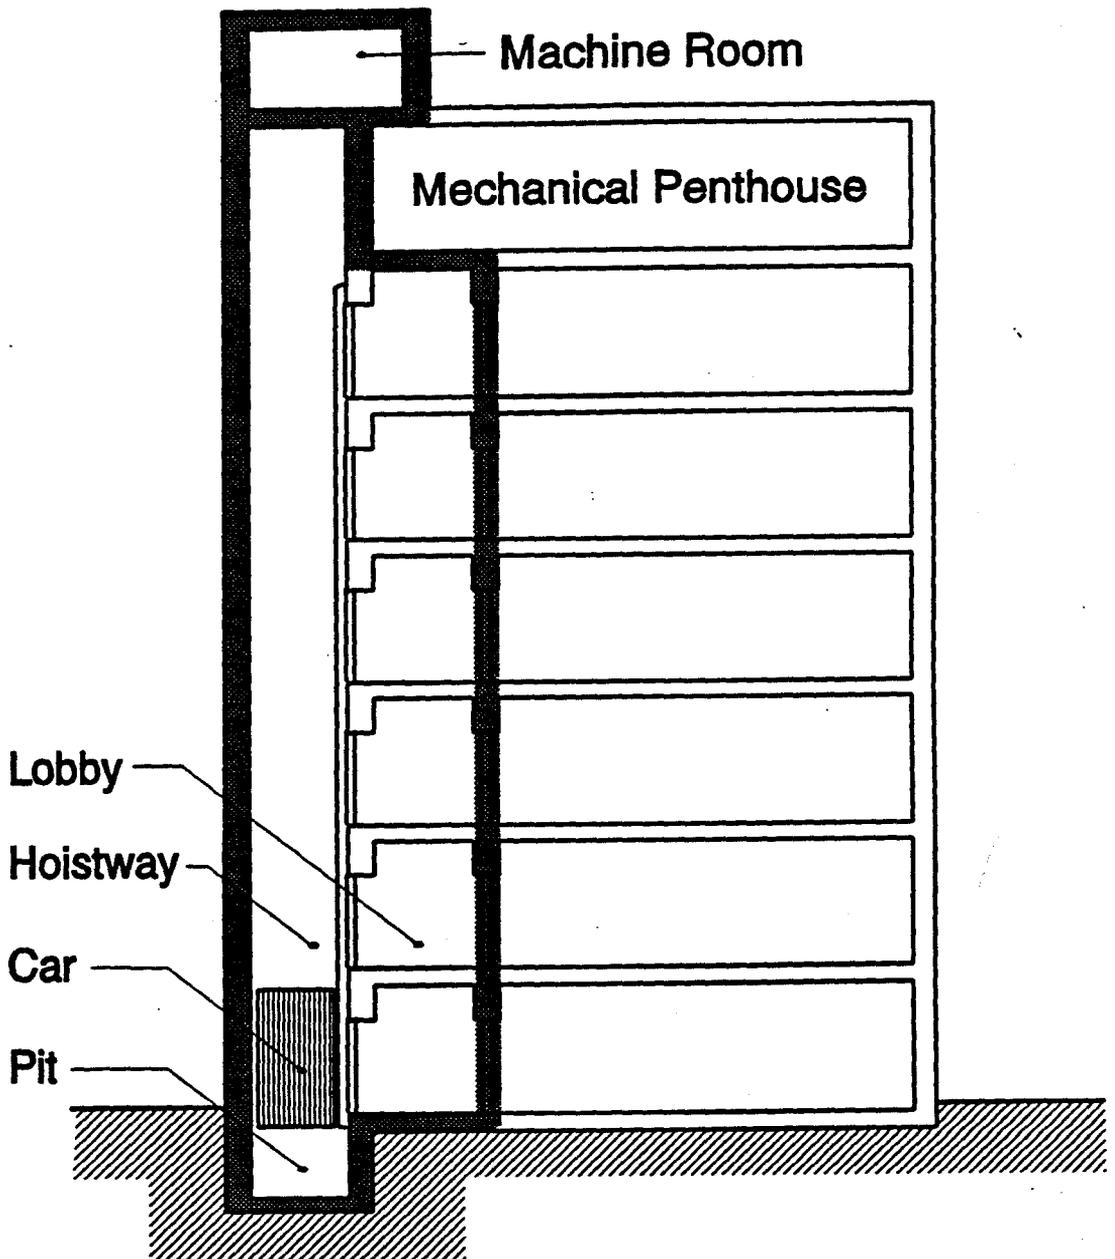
Elevator system including elevator equipment, machine room, hoistway and elevator lobby
